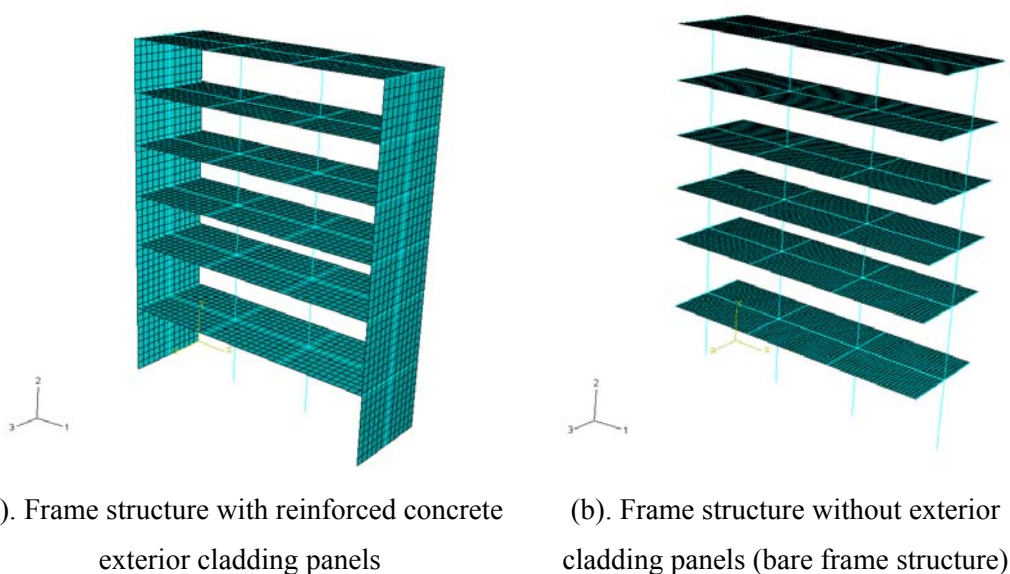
Modelling of the three-dimensional six-storey sub-frame structure
